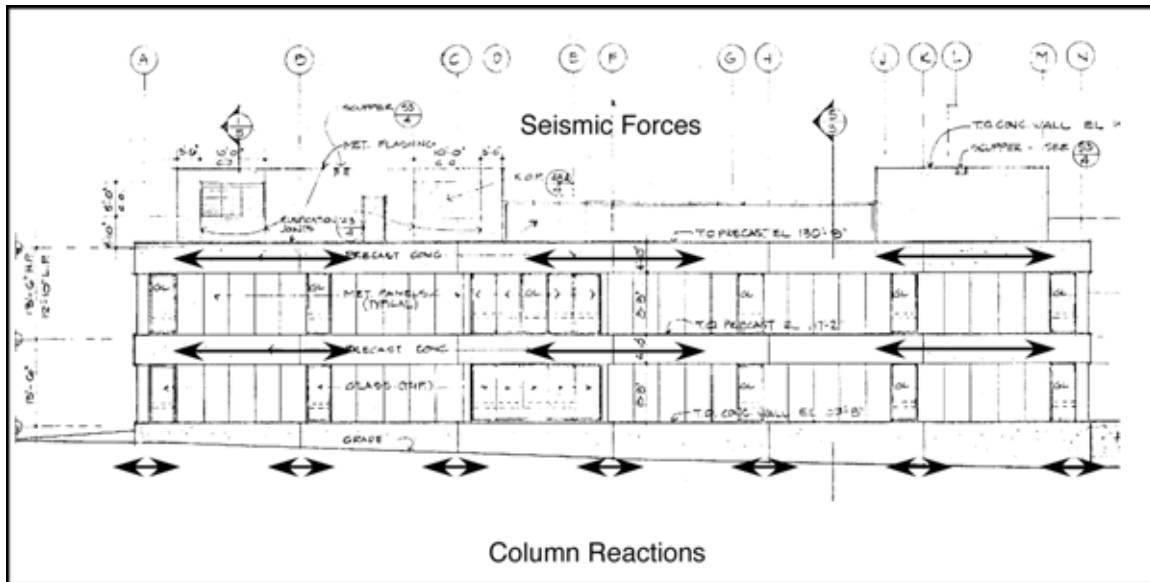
Seismic Load Path, East West Loading, Library (Elevation)
